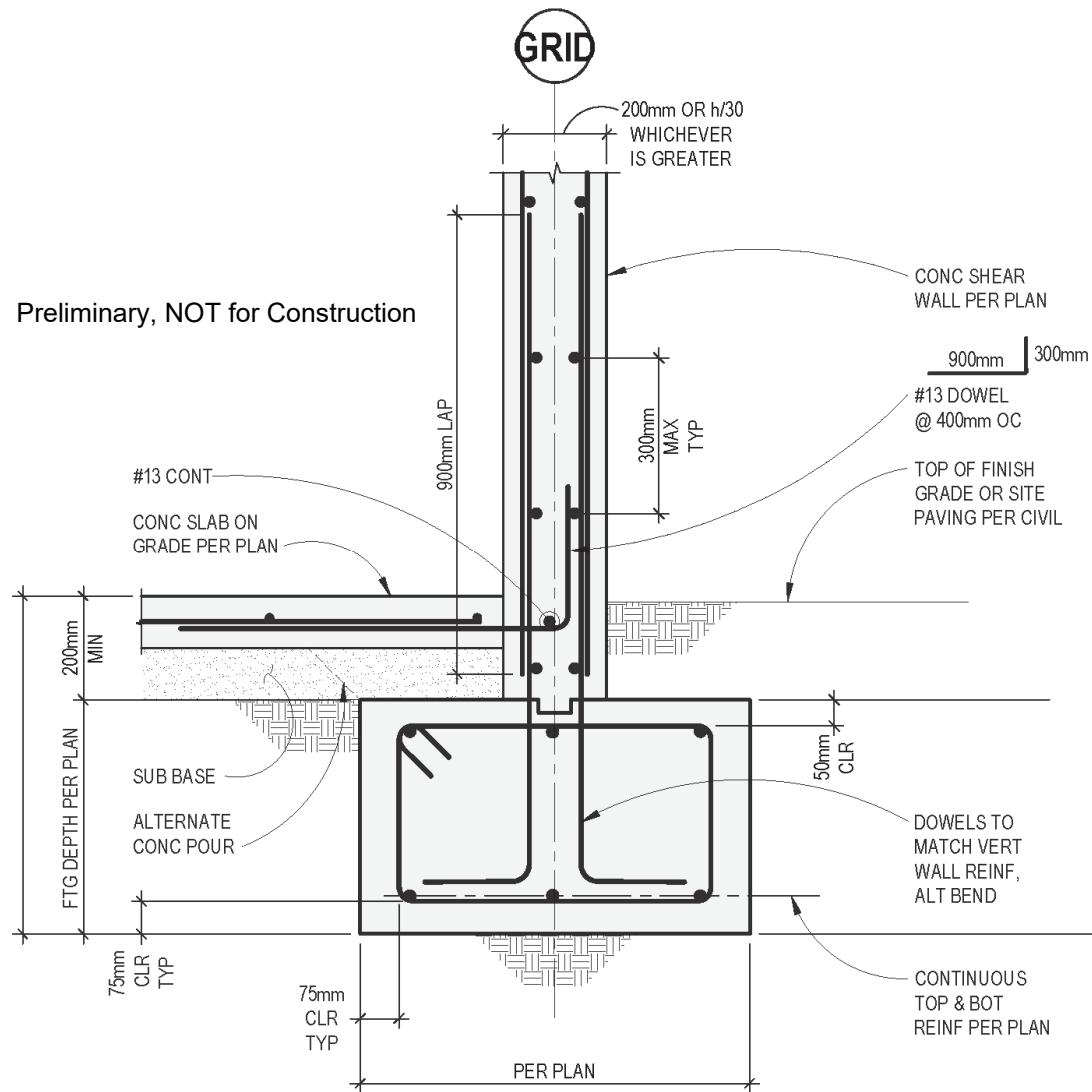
Conceptual detail of reinforced concrete shear walls at foundation (courtesy of MHP Structural Engineers).
